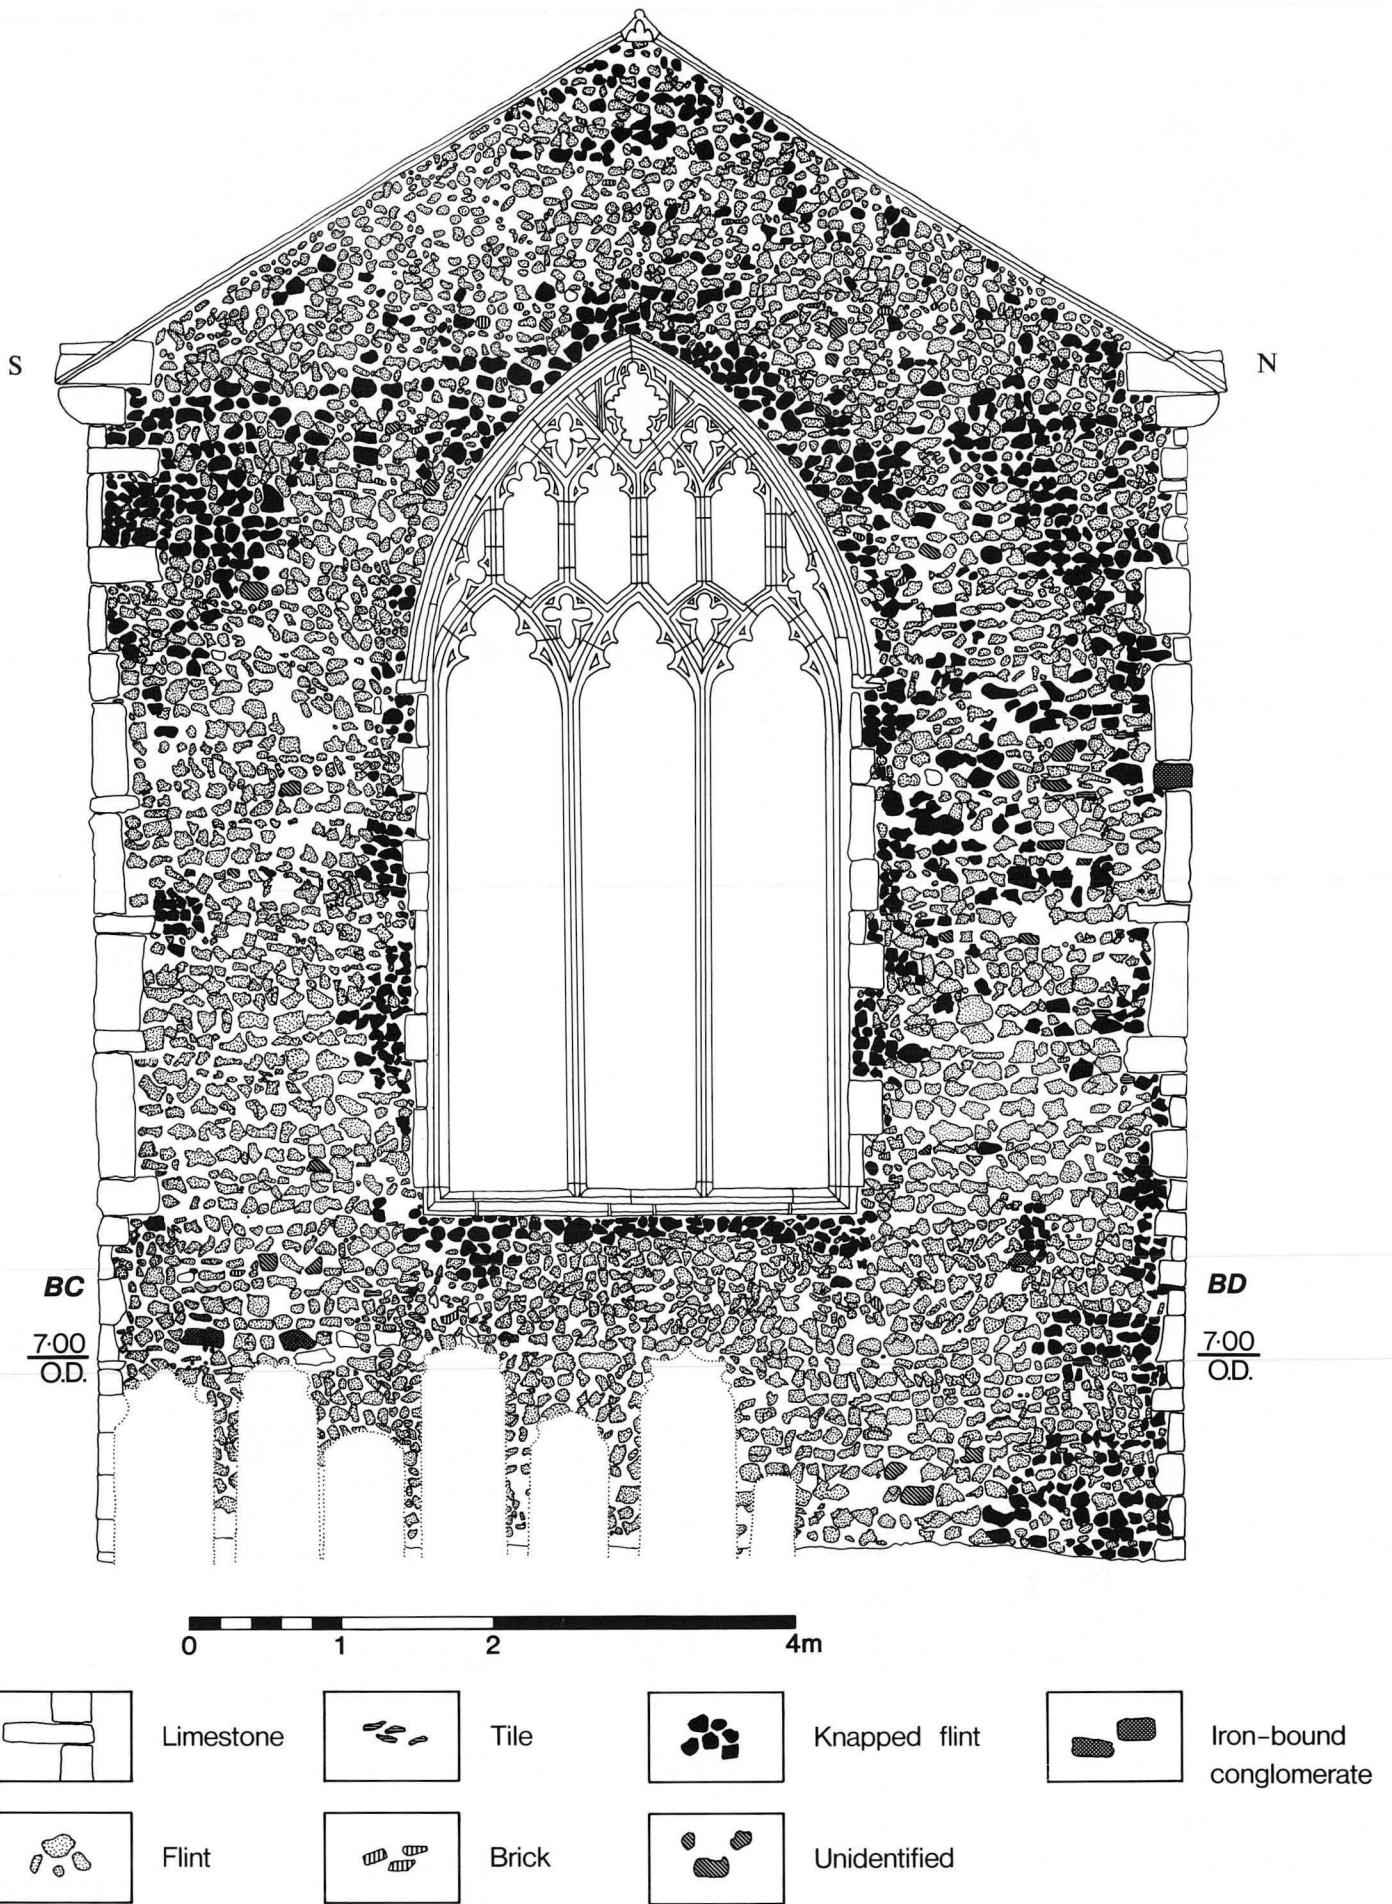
Elevation of exterior end wall of the chancel, BC-BD. Scale 1:50
